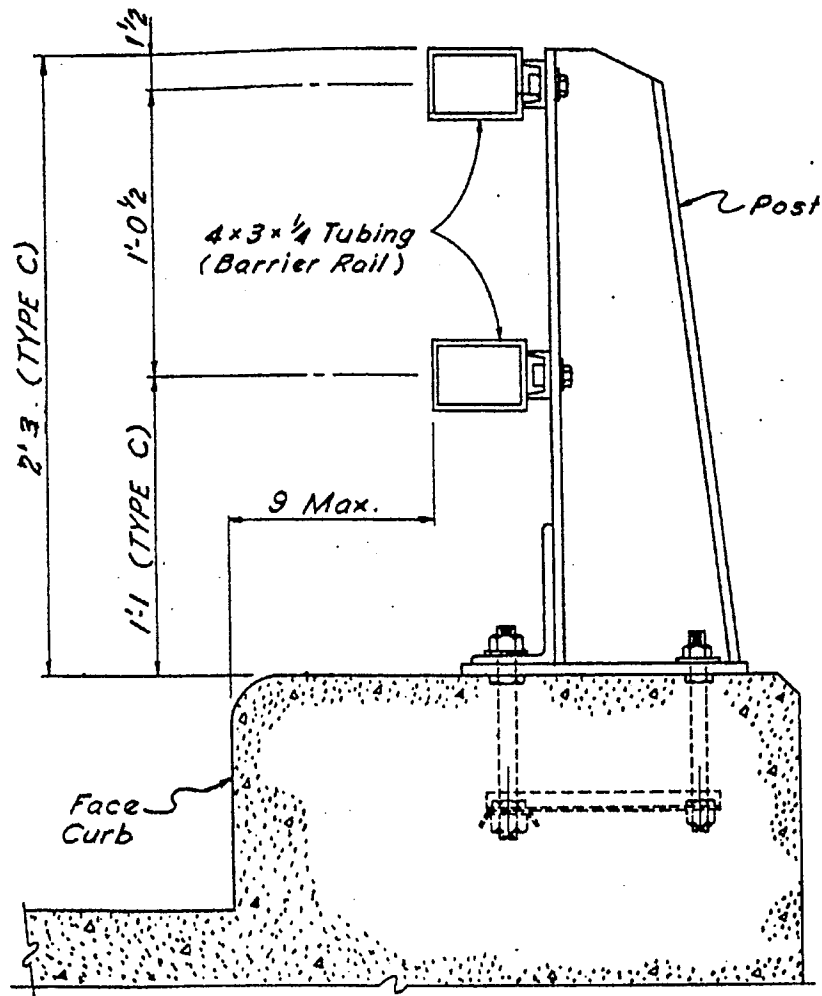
Type C Steel Tube Bridge Railing Cross-Section
